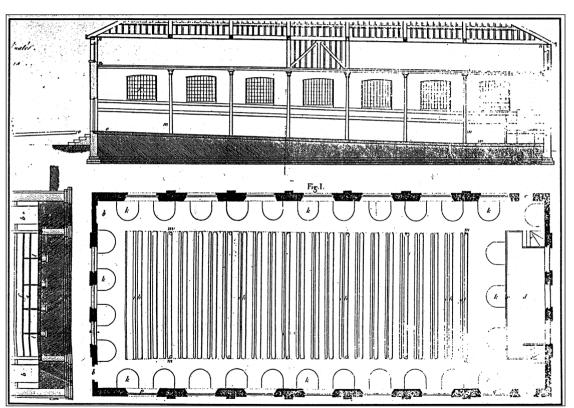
Ground Plan and Layout of Borough Road School, 1804 (artist unknown)
